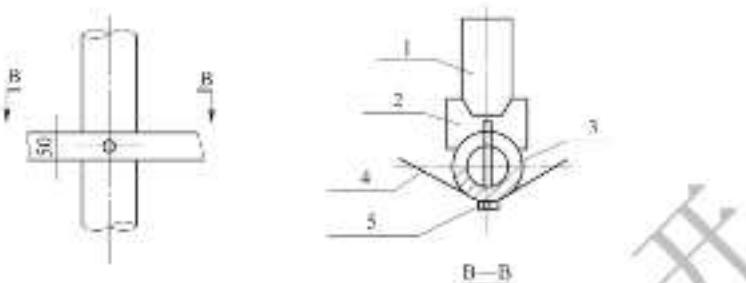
Connection of epoxy FRP pipe, circumferential fastening steel strip and pad
